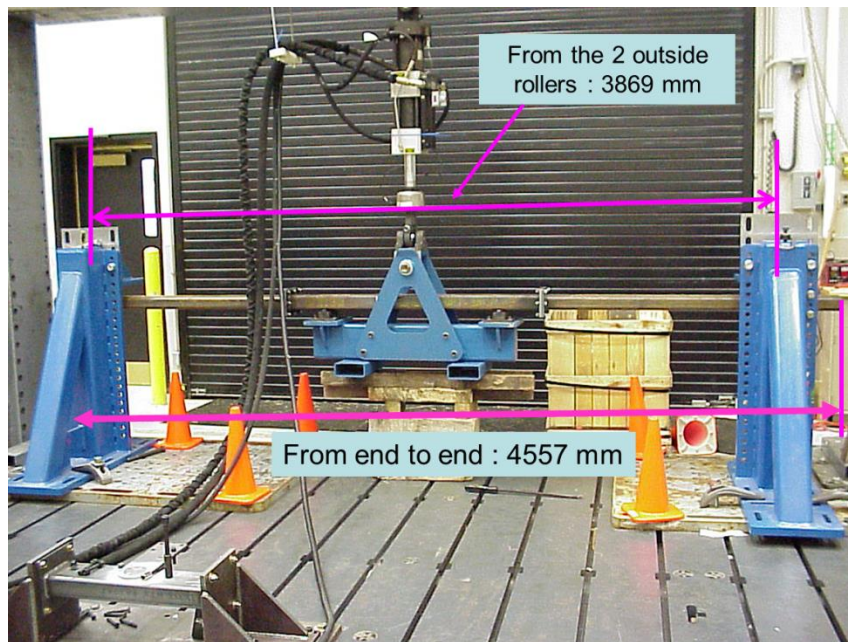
The fatigue test setup arrangement – beam weldment
